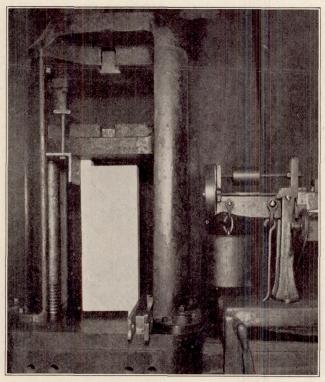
One method used to apply shearing loads to relatively short beam sections. (The dimensions of the test pieces appear in Table VII)
